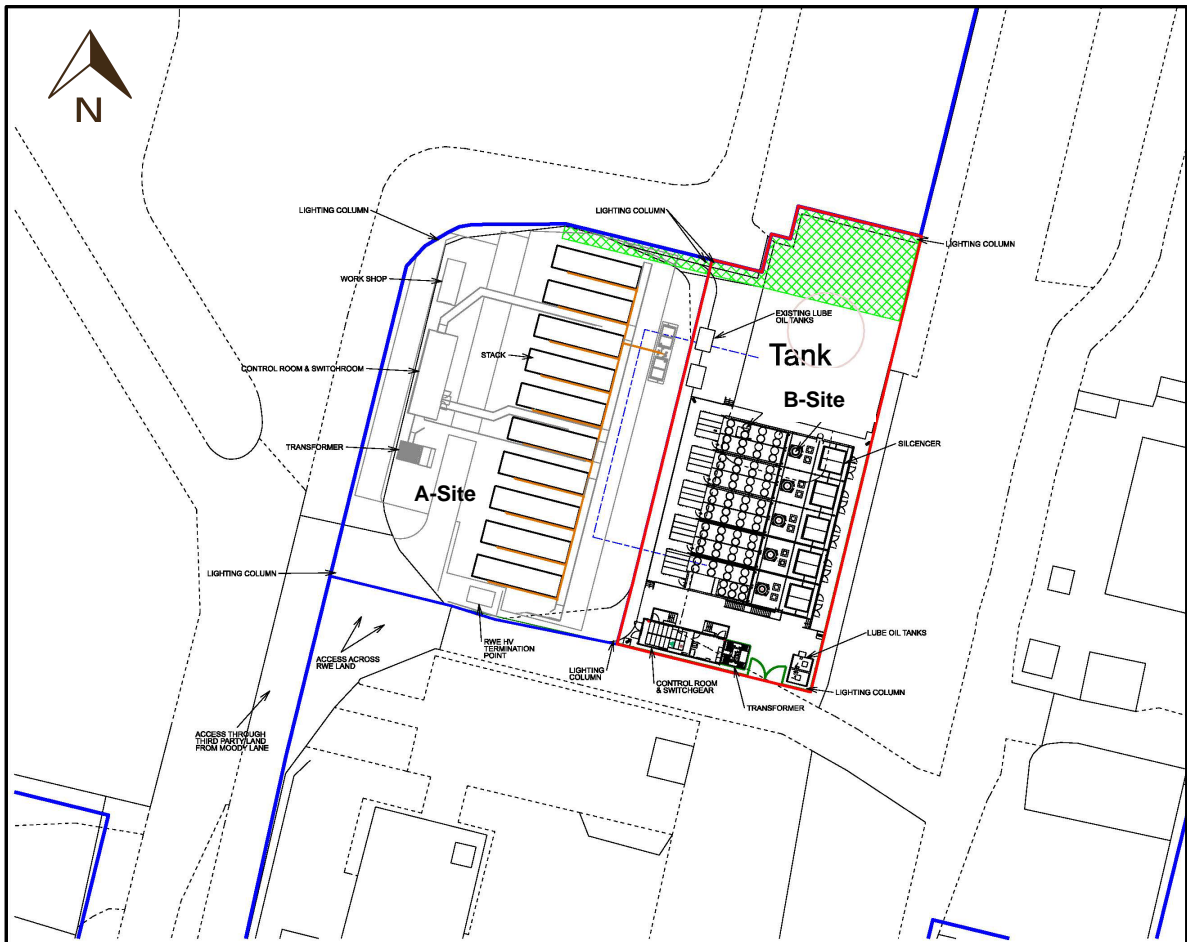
Plan of Grimsby A & B Sites showing as-built A-Site and proposed B-Site layout (red line boundary)
